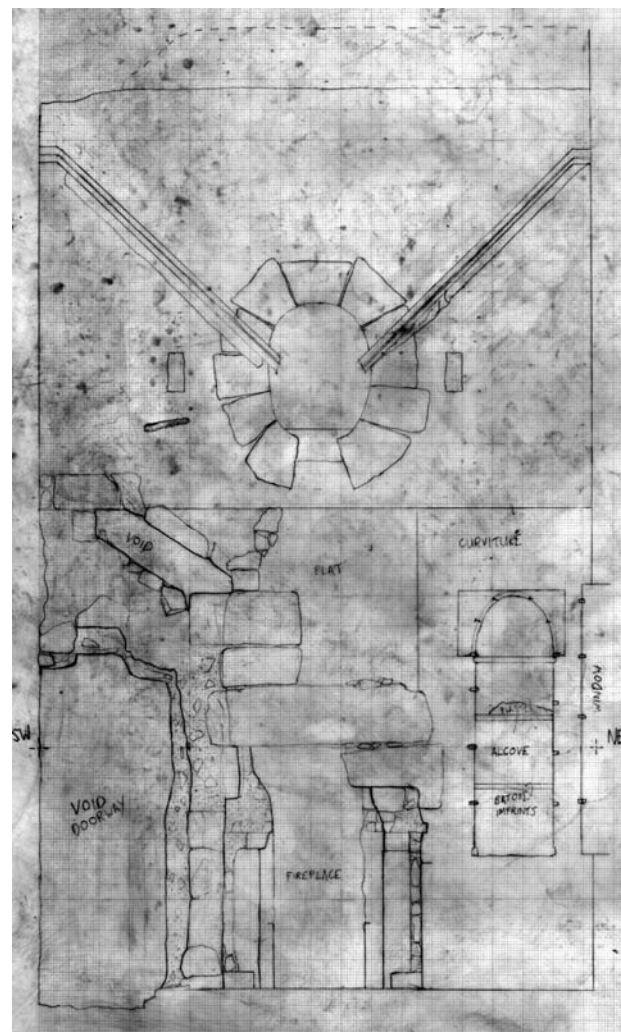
xx SE facing internal elevation of East Pavilion - Drawing No.013
